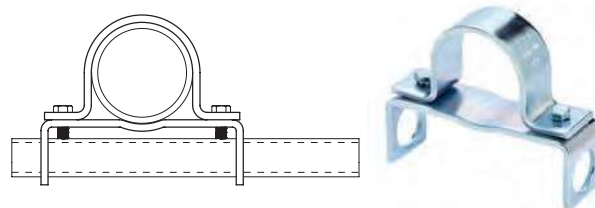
TOLCO structural attachment for branch line restraint assembly (UL listed) structural attachment for sway brace assembly (FM)
